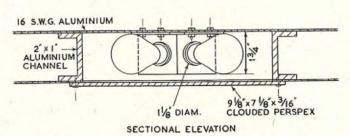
DETAILS OF LIGHTING FITTING IN ROOF SECTION.
